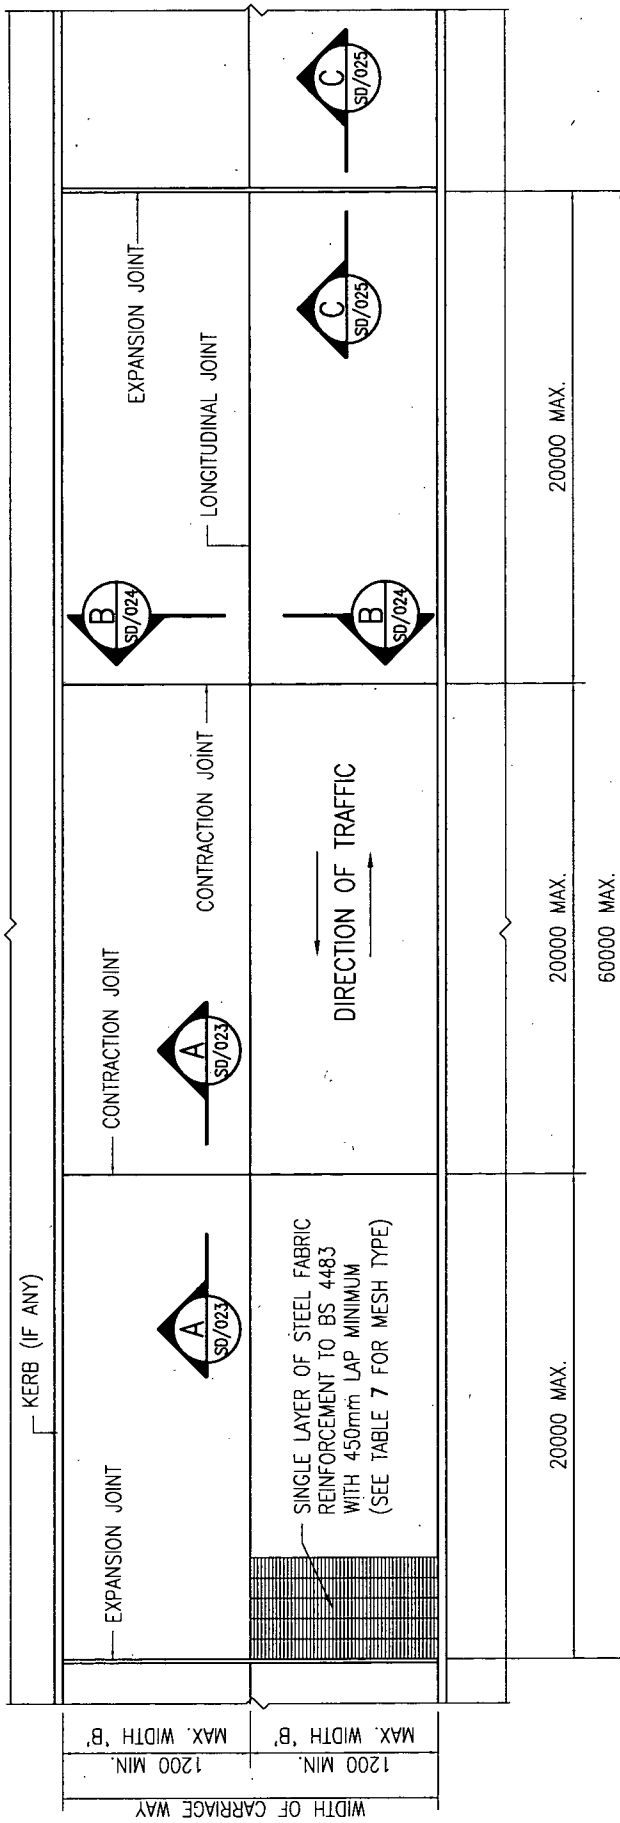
TYPICAL PART PLAN OF REINFORCED CONCRETE EXTERNAL DRIVEWAY AND CAR PARKING AREAS
